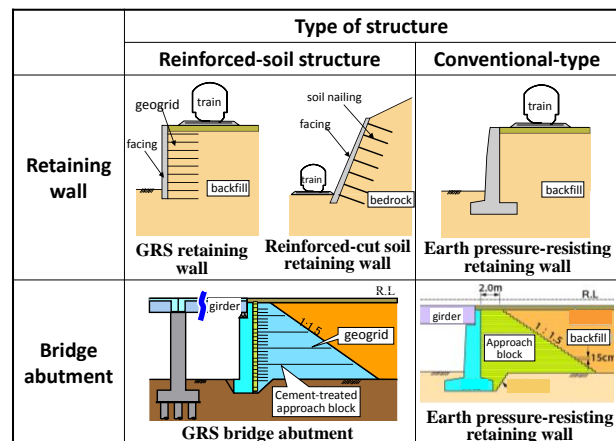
Classification of earth retaining structures covered under the new soil retaining structure standard (R.T.R.I, 2012)
